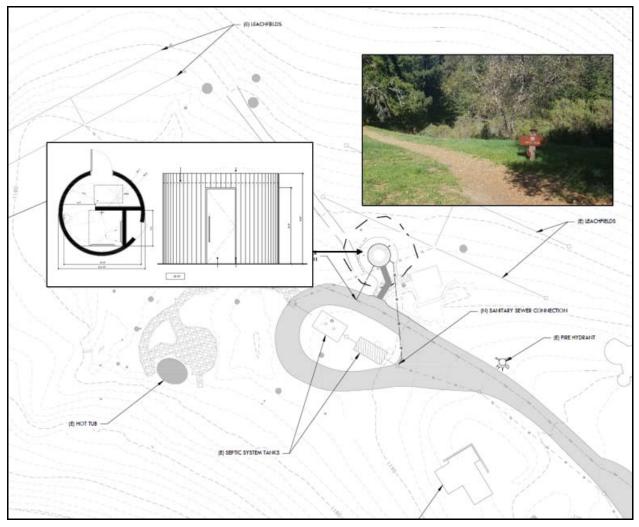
Proposed ADA Restrom Near Existing Hot Tub and Trail Head
